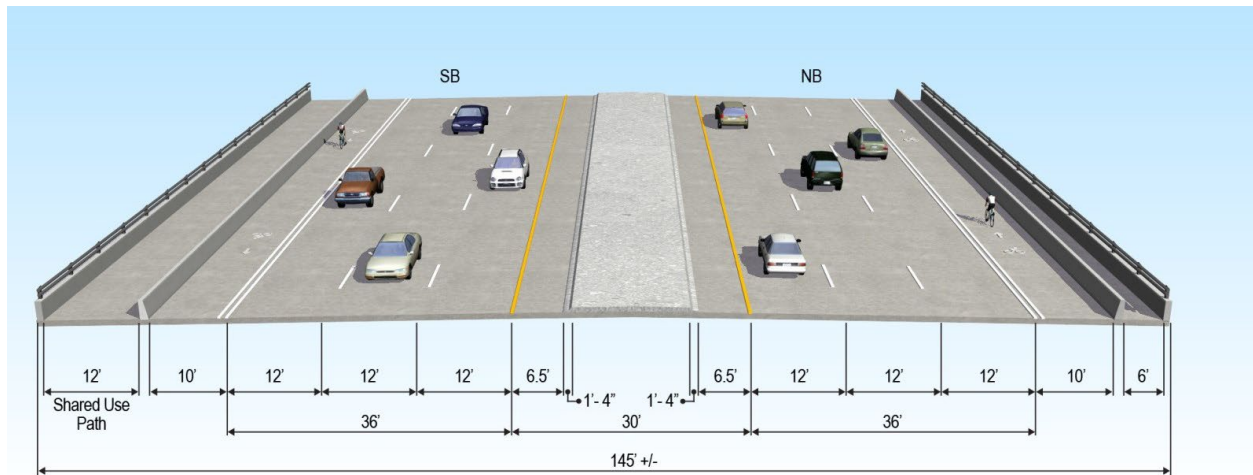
| Proposed Bridge Typical Section - US 41 Over Bullfrog Creek
